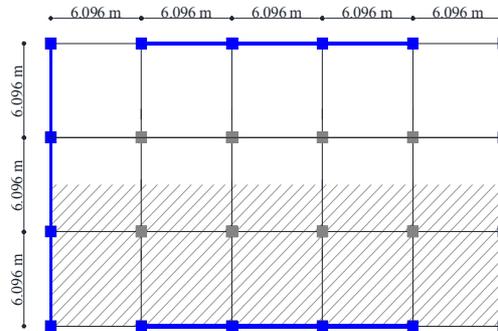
Structural plan of the 3-, and 6-story SMRFs.
